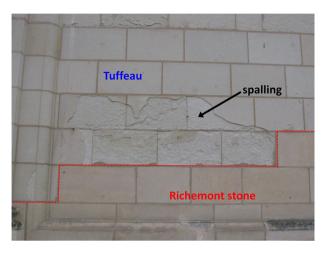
Spalling of Tuffeau in the wall of the "Château de Chambord" and the replacement stone (Richemont stone).
